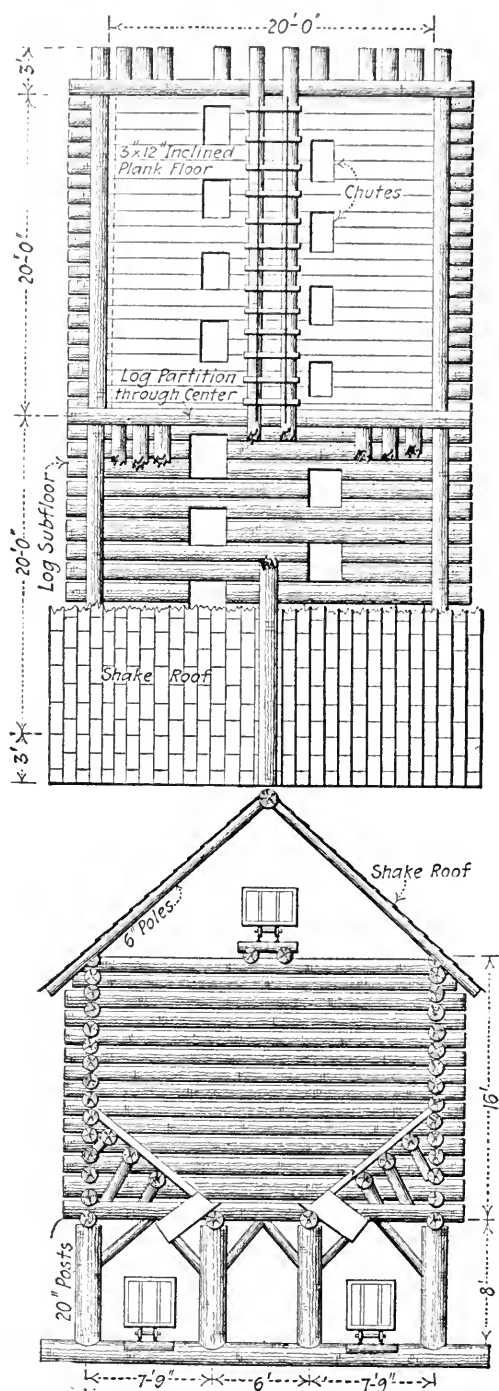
PLAN AND SECTION OF ROUND-TIMBER BIN.
